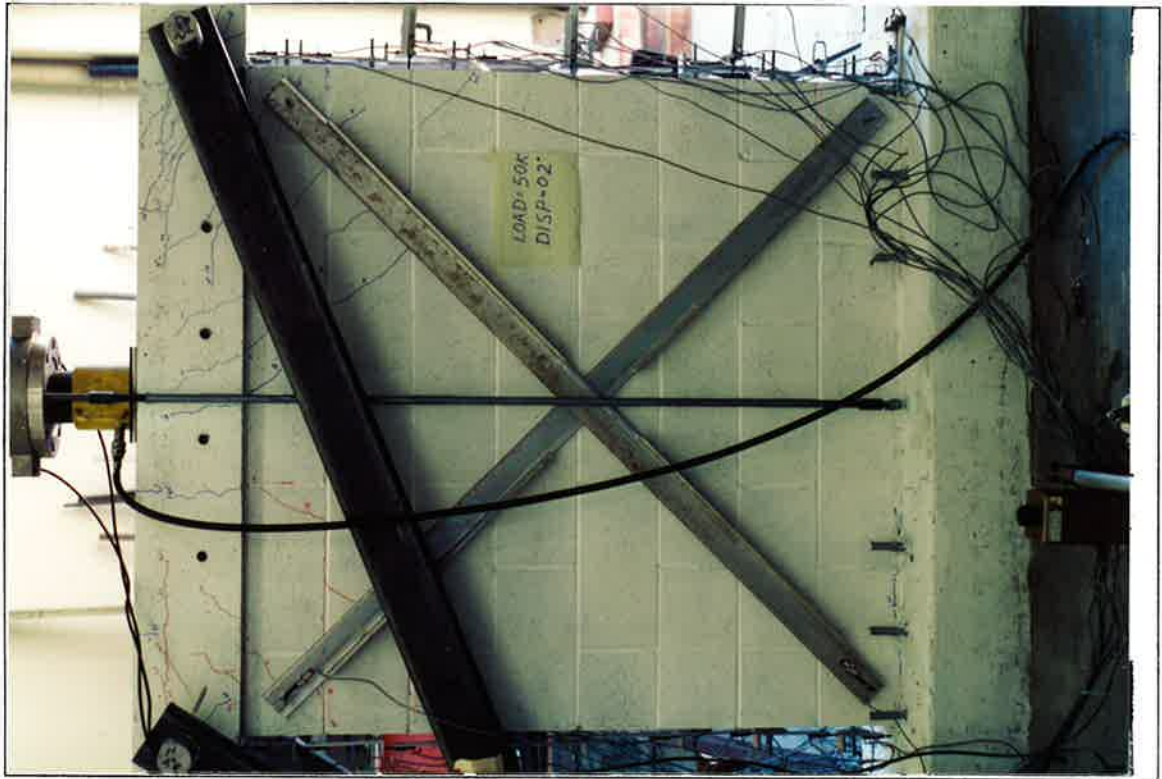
Monolithic Wall At 222 kN (50 Kips) Lateral Load
